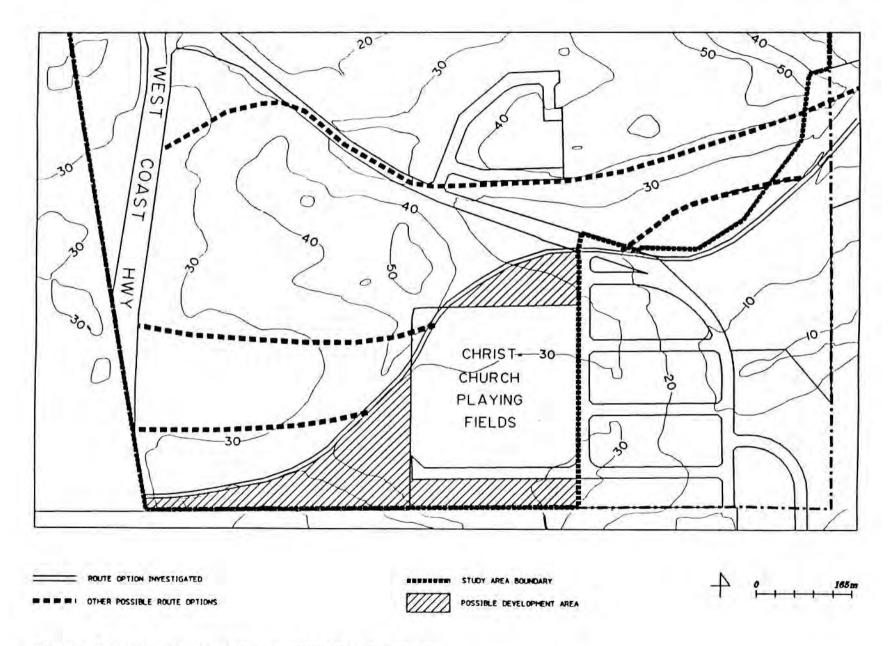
REALIGNMENT OF ROCHDALE ROAD
